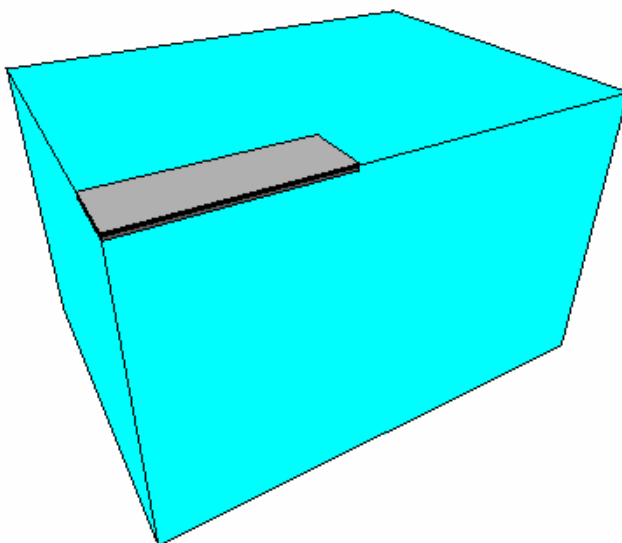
Same model as in Figure 1, but with the separating wall (and its foundation) removed and replaced by the floor construction
